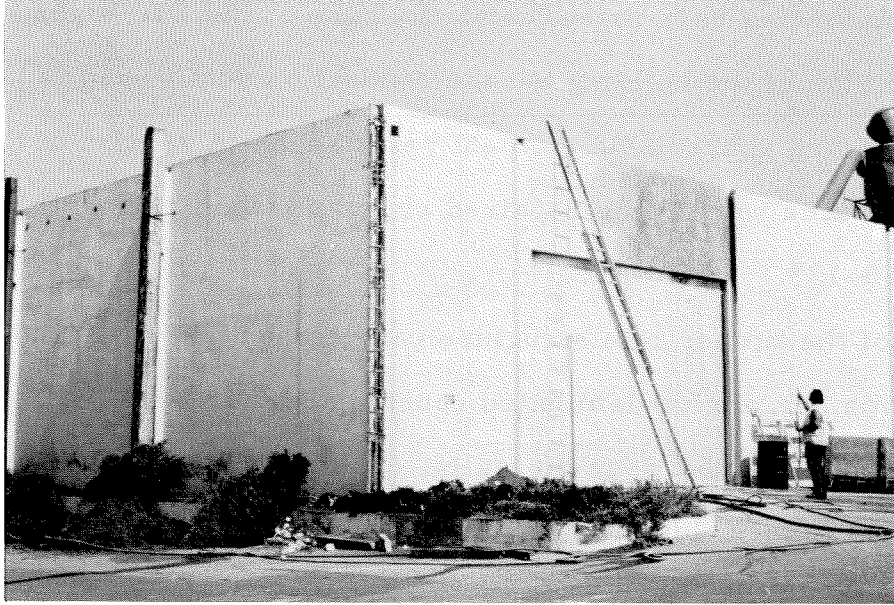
Repair of cracked tilt-up walls. A sand-blasting operation prior to application of gunite. Sawyer Cabinet Inc. building.
